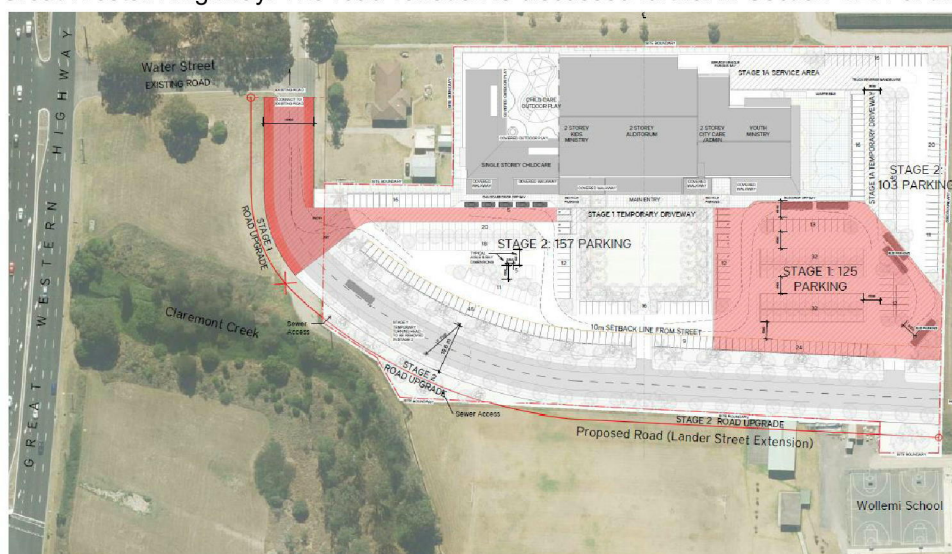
Extract of Proposed Site Plan (Source: NBR Architecture 2017)
